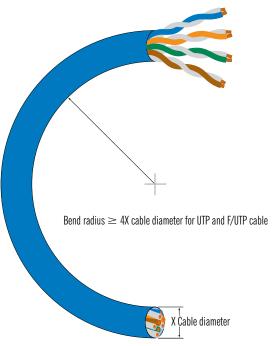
Minimum Bend Radius UTP and F/UTP Cable
